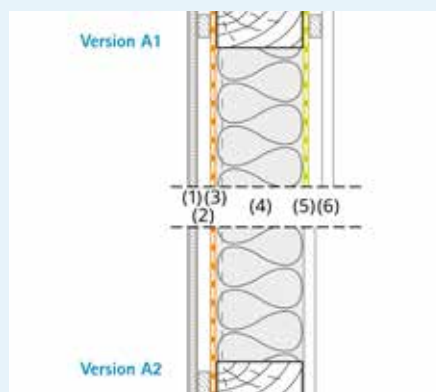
Wall construction A (1) Pre-finished fibre cement, 10 mm; (2) Drainage cavity, 20 mm; (3) Wall wrap, SOLITEX EXTASANA®; (4) Insulation, 90 mm; (5.1) No airtightness layer (A2); (5.2) Airtightness layer INTELLLO® PLUS (A1); (6) Gypsum plasterboard, 10 mm
